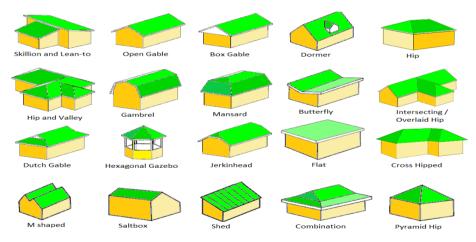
Roof formsSource: Rahman (2021)1. Lean-to or shed roof. It is the most common type of roof that slopeson one side only.
